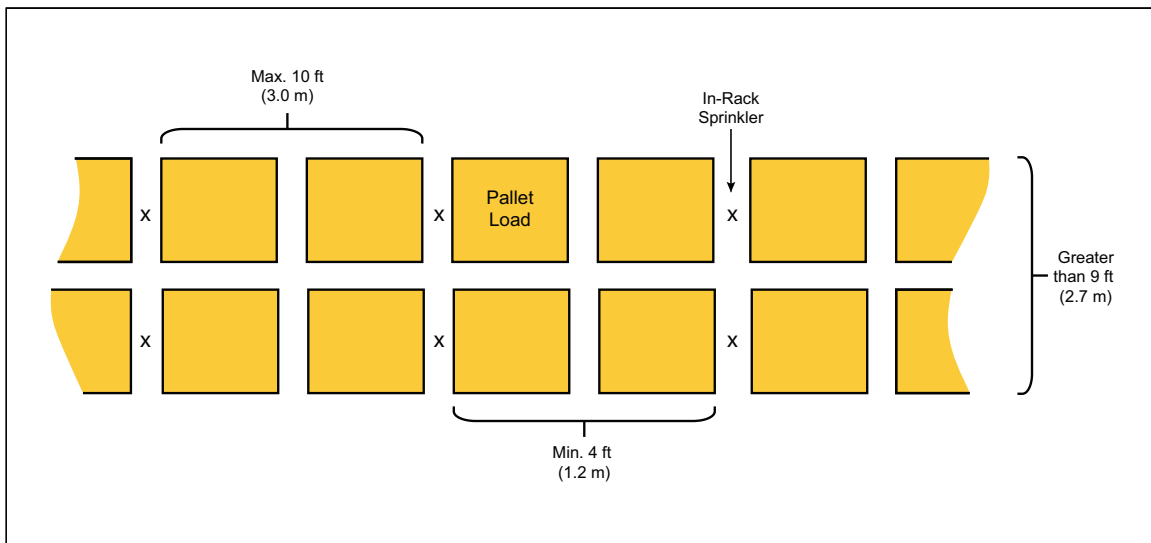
Plan view of IRAS(EO) horizontal in-rack sprinkler arrangement for double-row racks over 9 ft (2.7 m) deep
